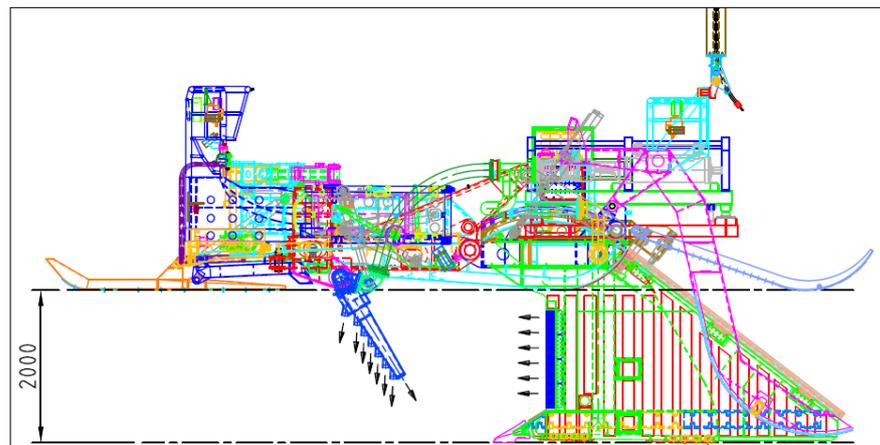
MD3 shown in 3.0m burial mode; front jet tool deployed and jetting through share leading edge and under heel
